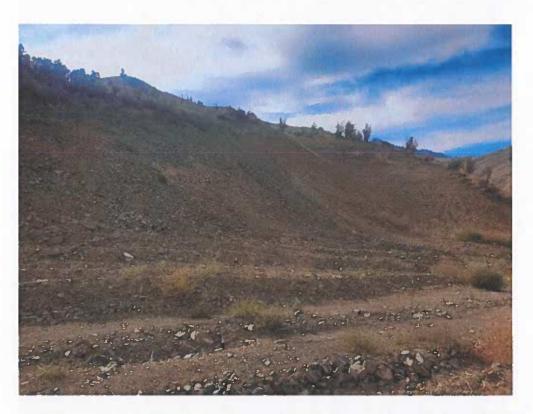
Cut slope southwest of building pad on Parcel 222007000125
